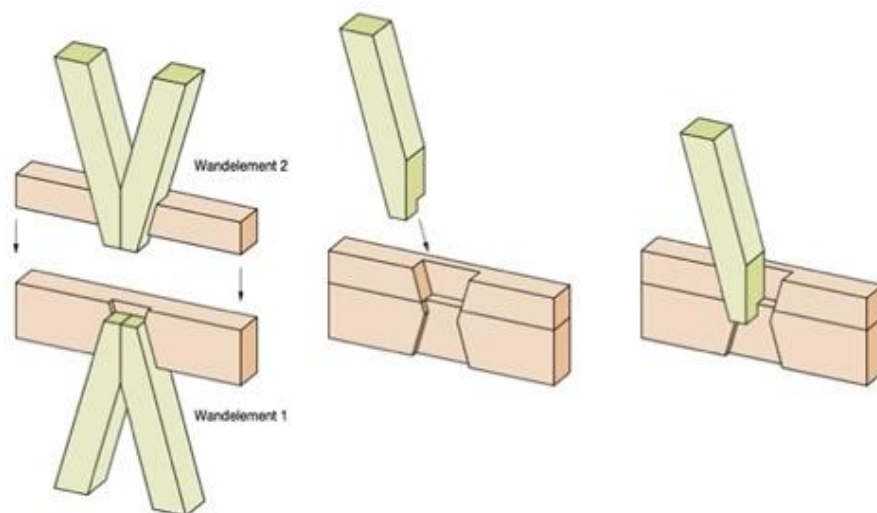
Joints of the half-timbered façade elements, Image: MKP
